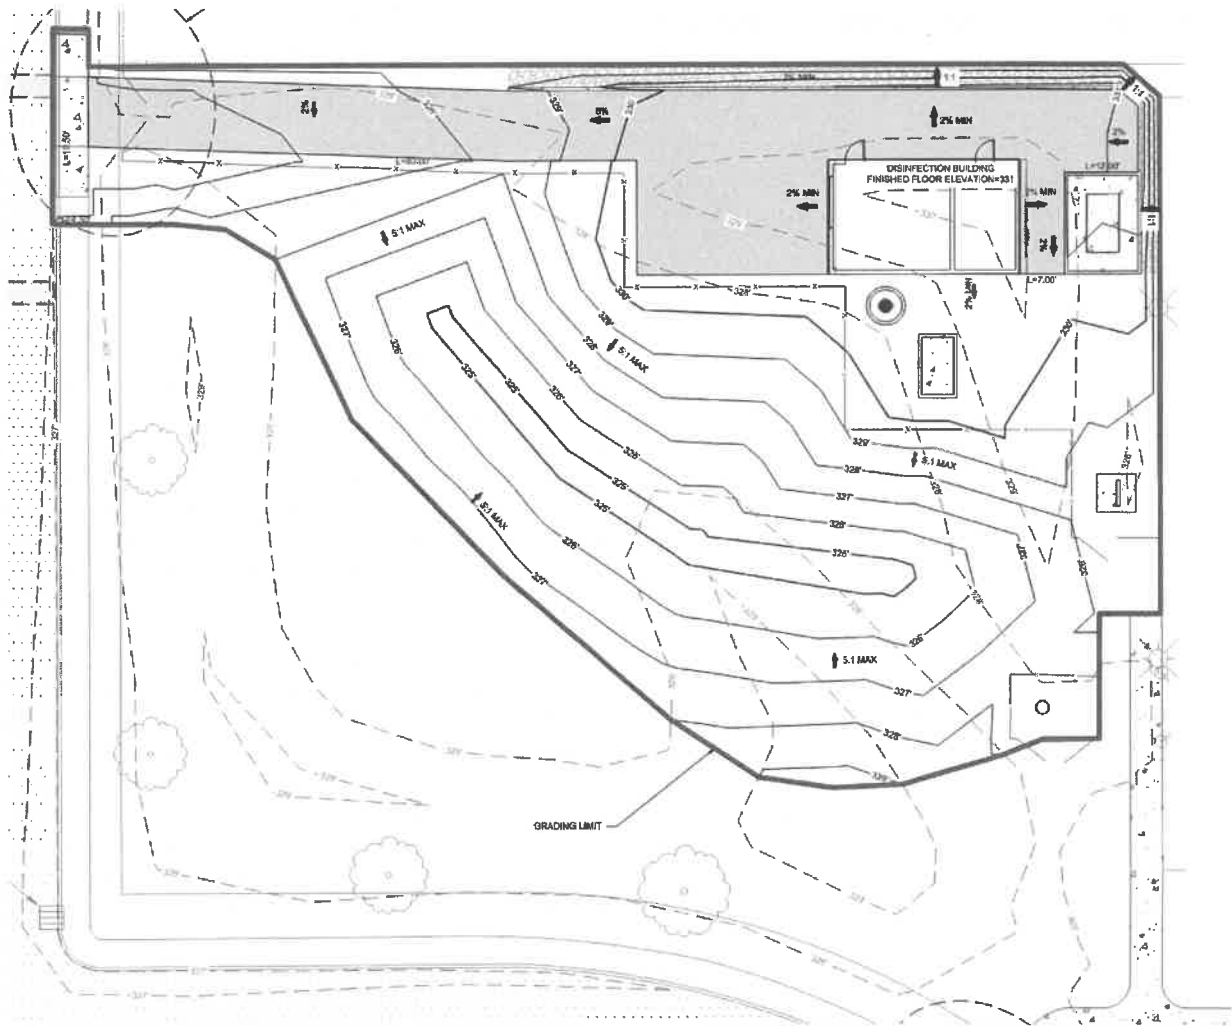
Proposed Building Grading (snapshot from Appendix A – Grading Plan)
